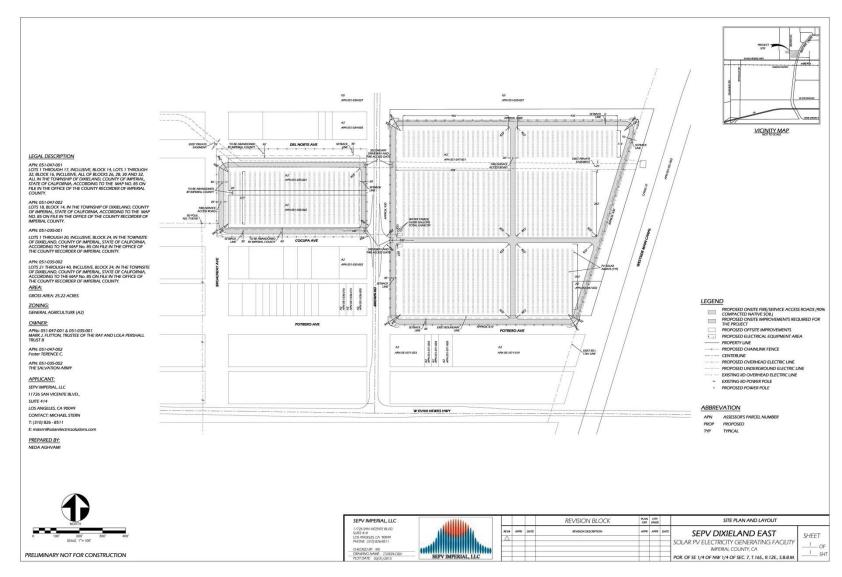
SEPV DIXIELAND EAST PROJECT SITE PLAN
